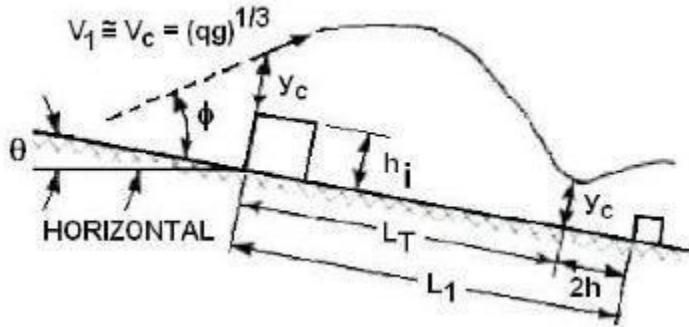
Tumbling flow in a box culvert or open chute: alternative configuration, Figure 7.2b in HEC-14
